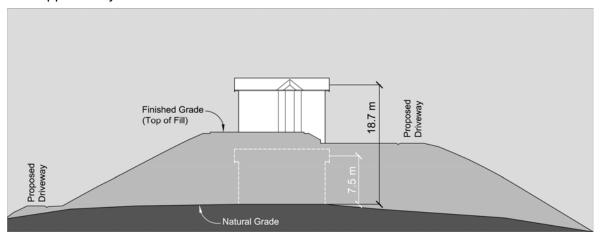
Section looking West showing Proposed Dwelling and requested Height Variance
